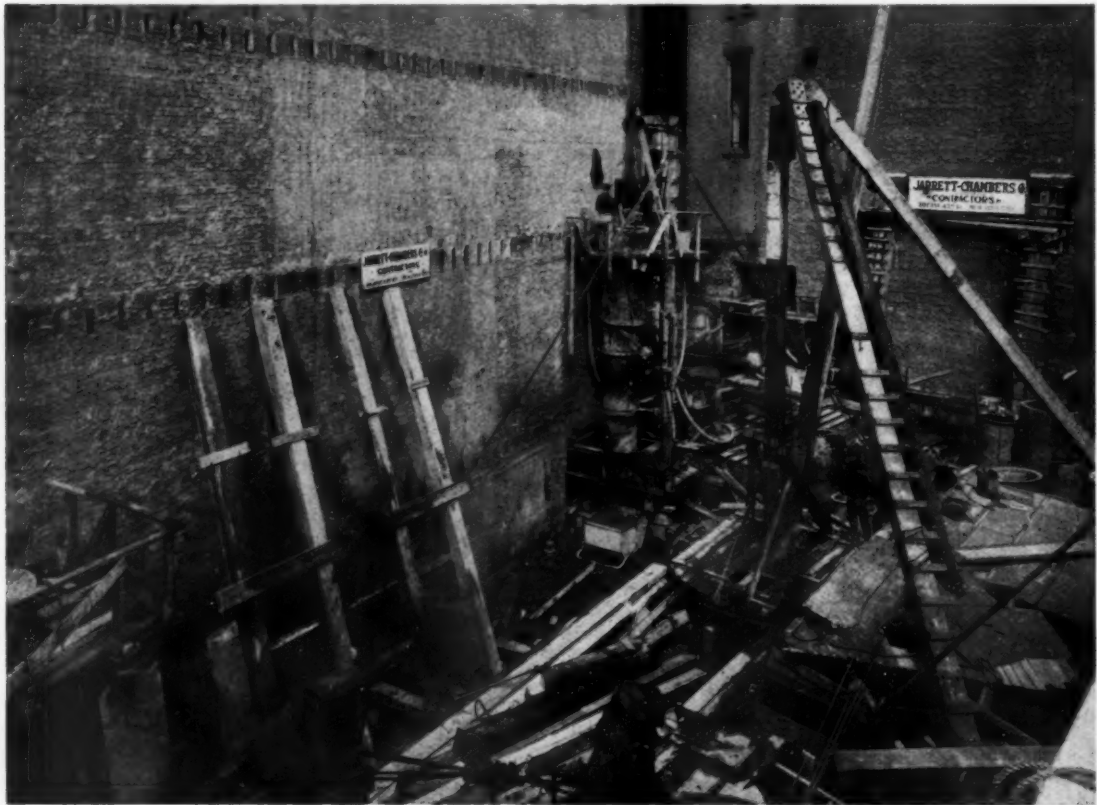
View of Section One of new Standard Oil Building, New York City, showing east wall of Beaver Street wing of the Welles Building and south wall of old Standard Oil Building
